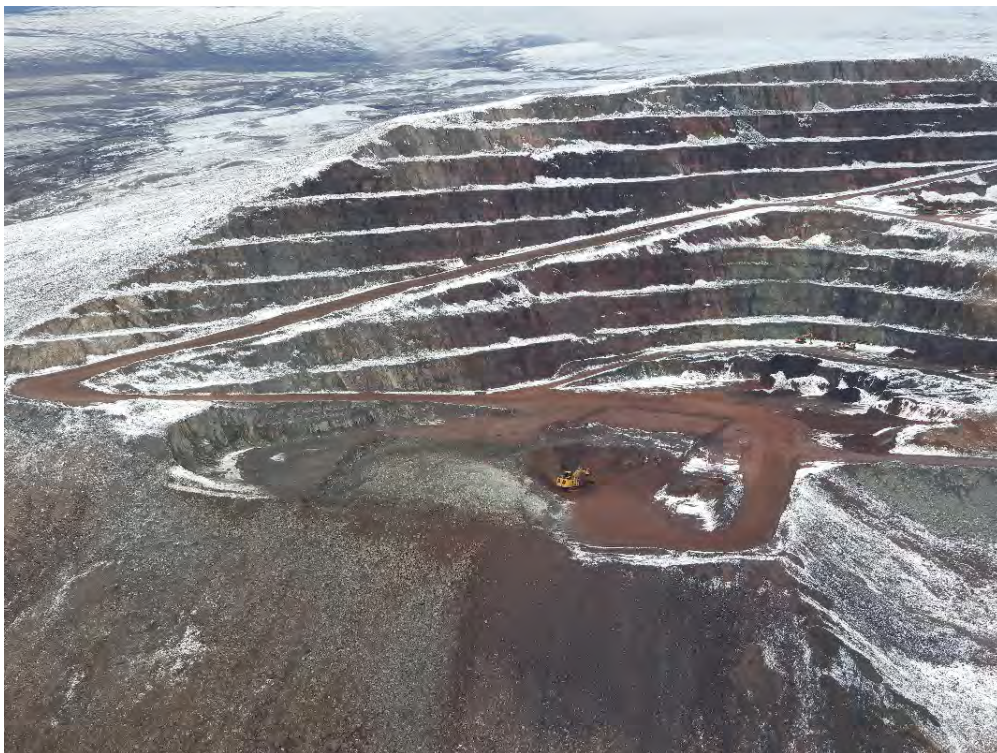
Deposit No. 1 Nuluujaak Pit Walls - September 2023
